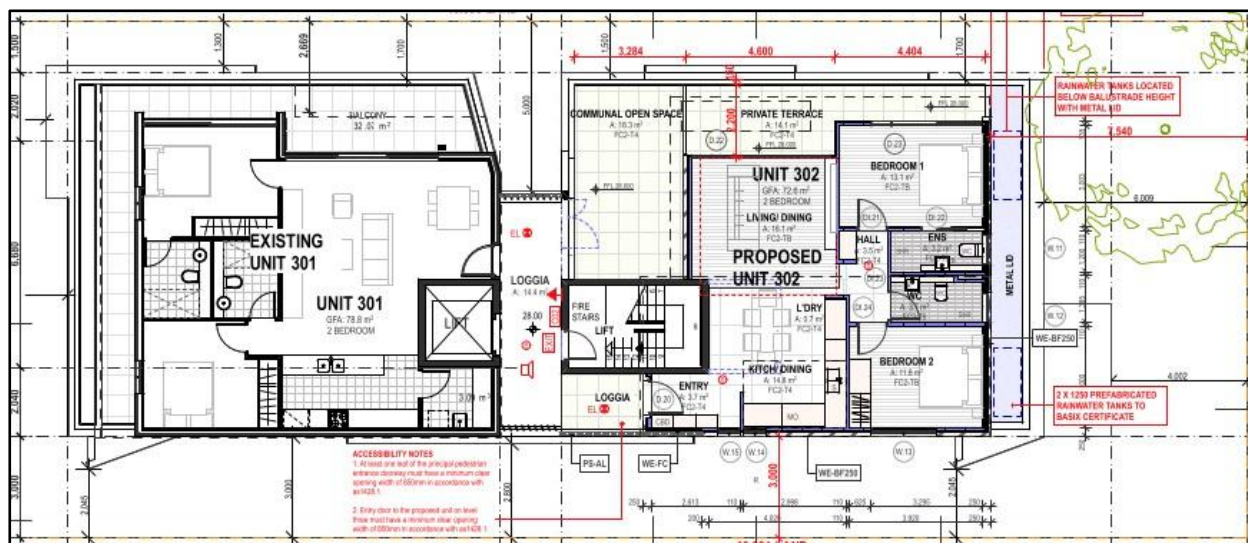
Proposed Level 03 Plan under DA-166/2026.
